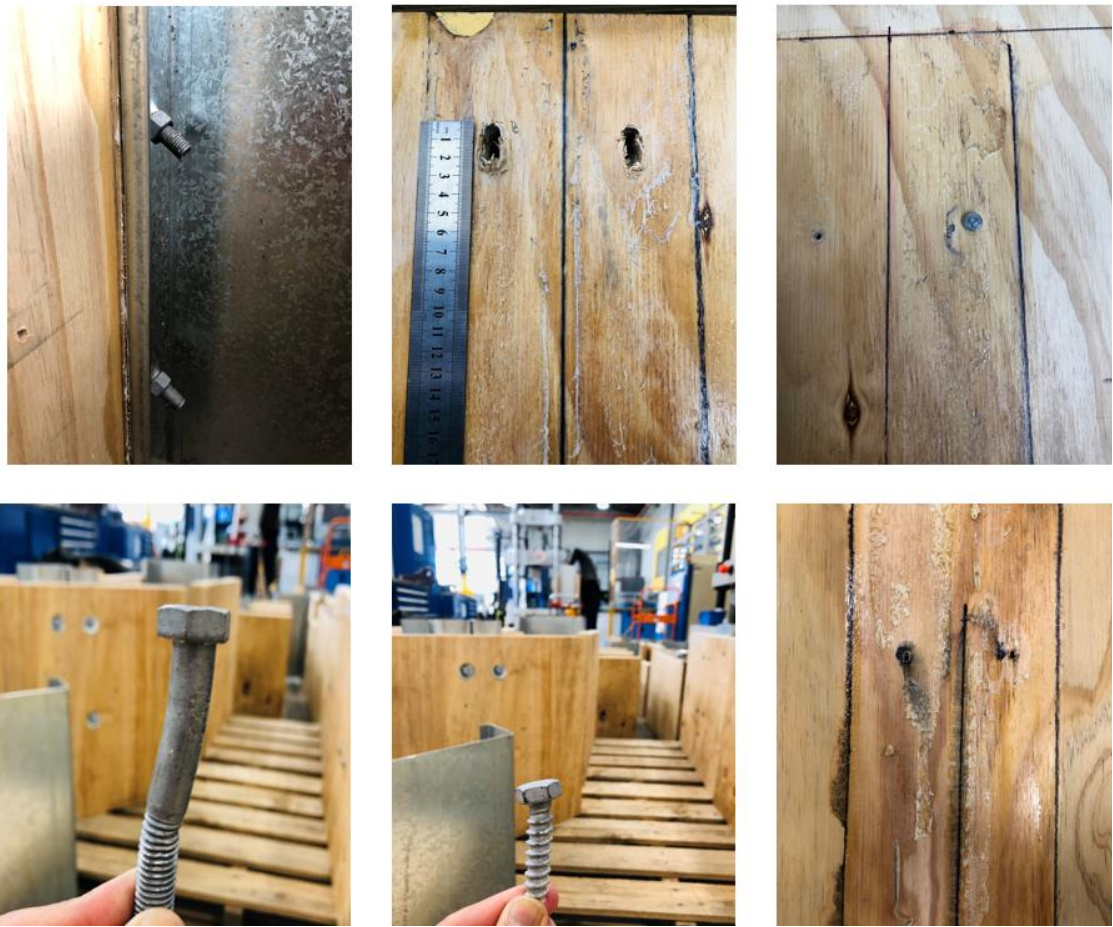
Failure modes of the specimens with fasteners + adhesives
